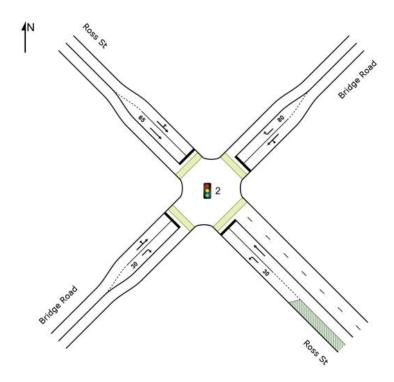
Existing layout of the Bridge Road and Ross Street intersection
